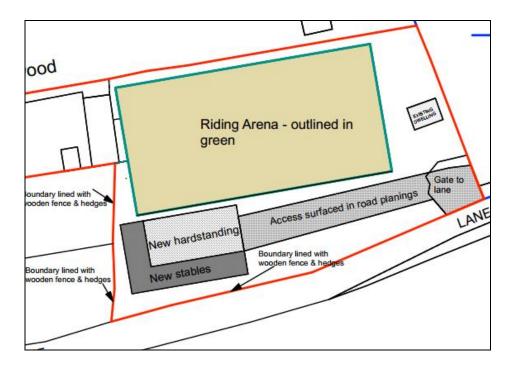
Extract from site layout as constructed (extract from drawing 132/01 AP1) (not to scale)
